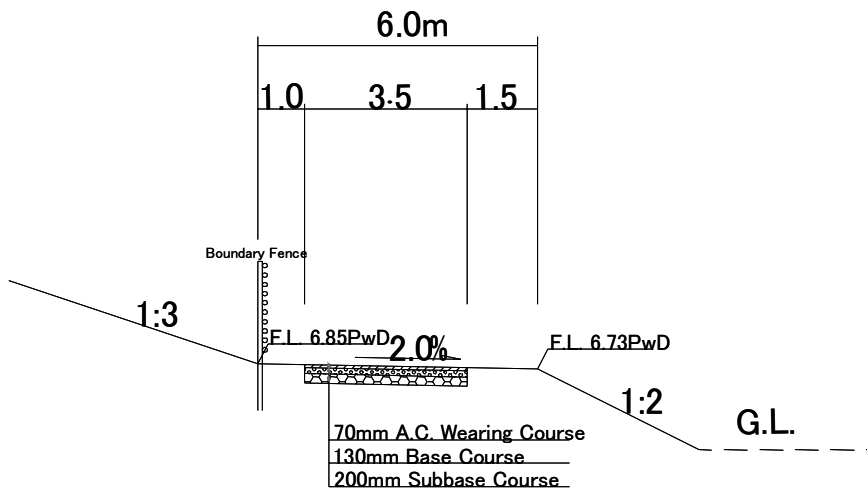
Typical Cross Section for Pavement of Service Road
